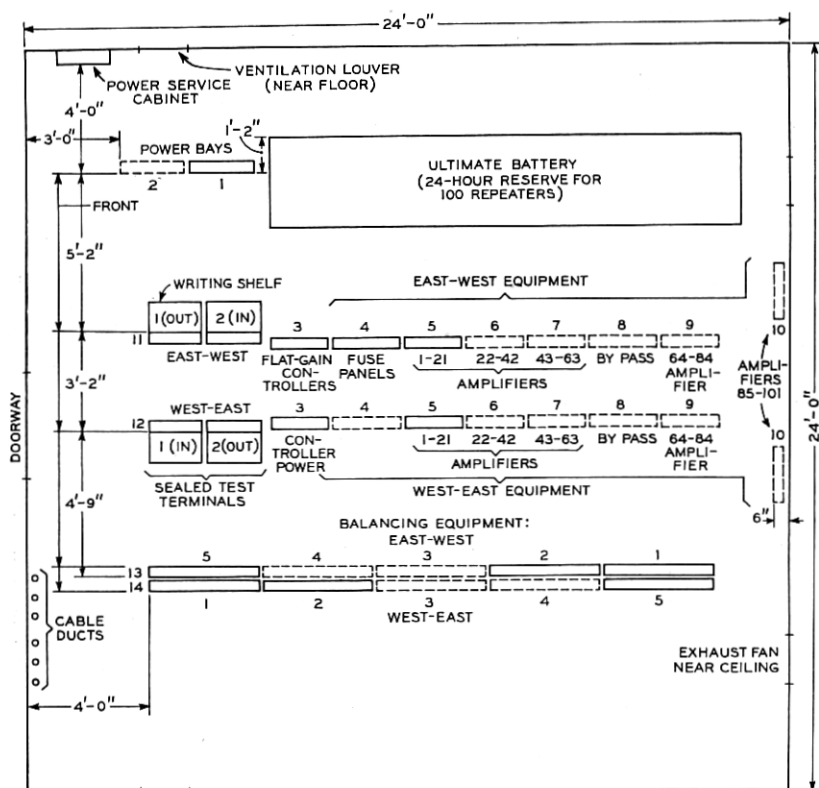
Floor plan arrangement of equipment for 100 systems at an auxiliary repeater station.
